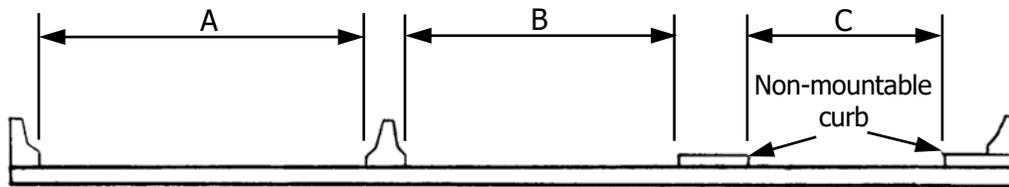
Cross-section view of a bridge deck with non-mountable curb and median barrier.
